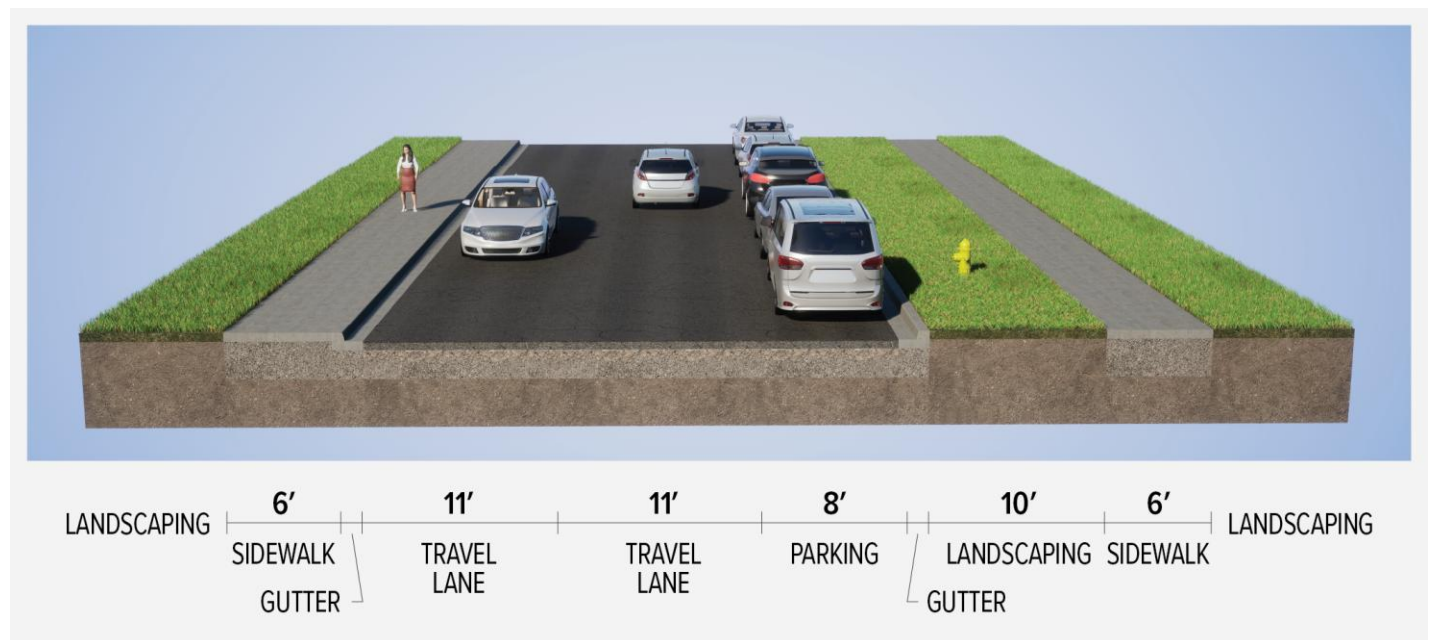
HARRIMAN STREET CROSS-SECTION BETWEEN HAWTHORNE AVENUE AND FRANKLIN AVENUE, LOOKING NORTH
